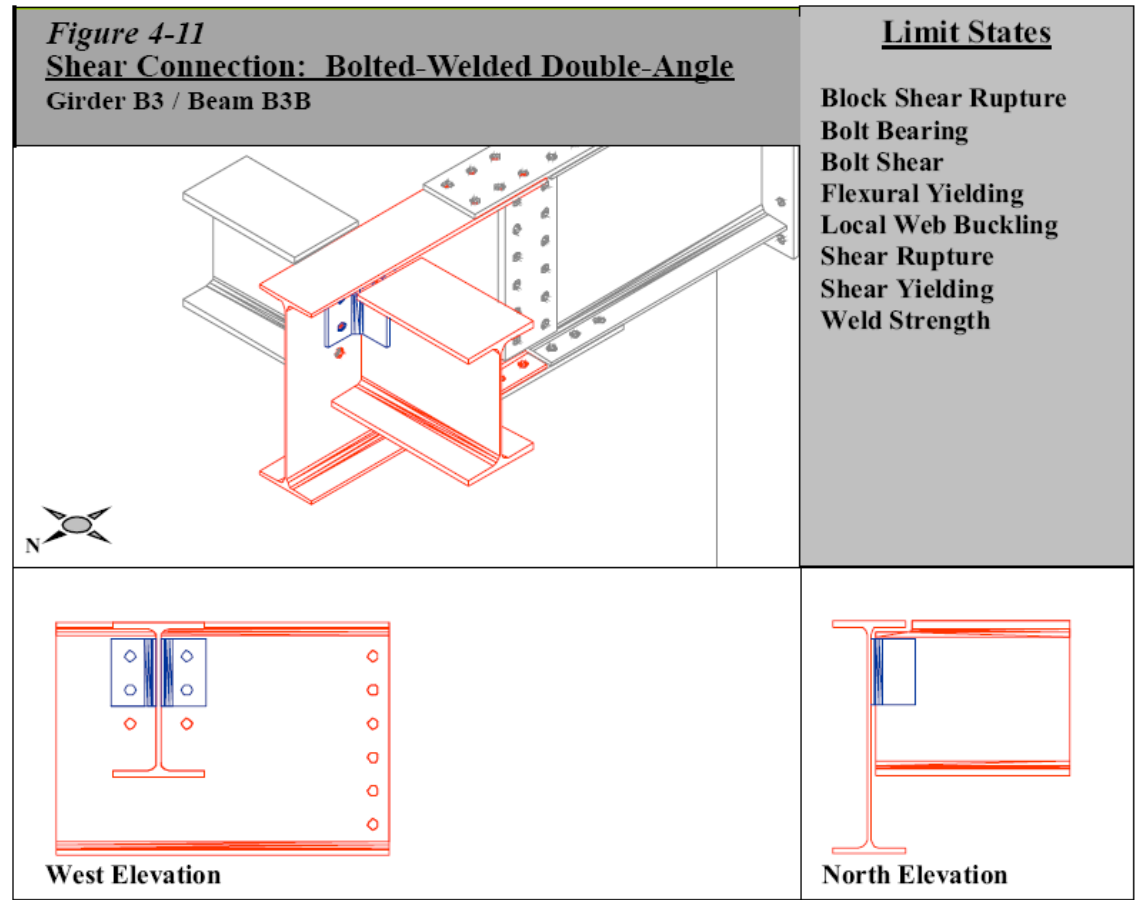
Shear Connection: Bolted-welded double-angle Girder B3 / Beam B3B
